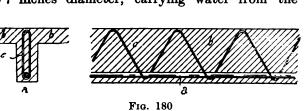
are similar views of a beam with three rods. The construction is monolithic, and the beams are designed as of T-section.
